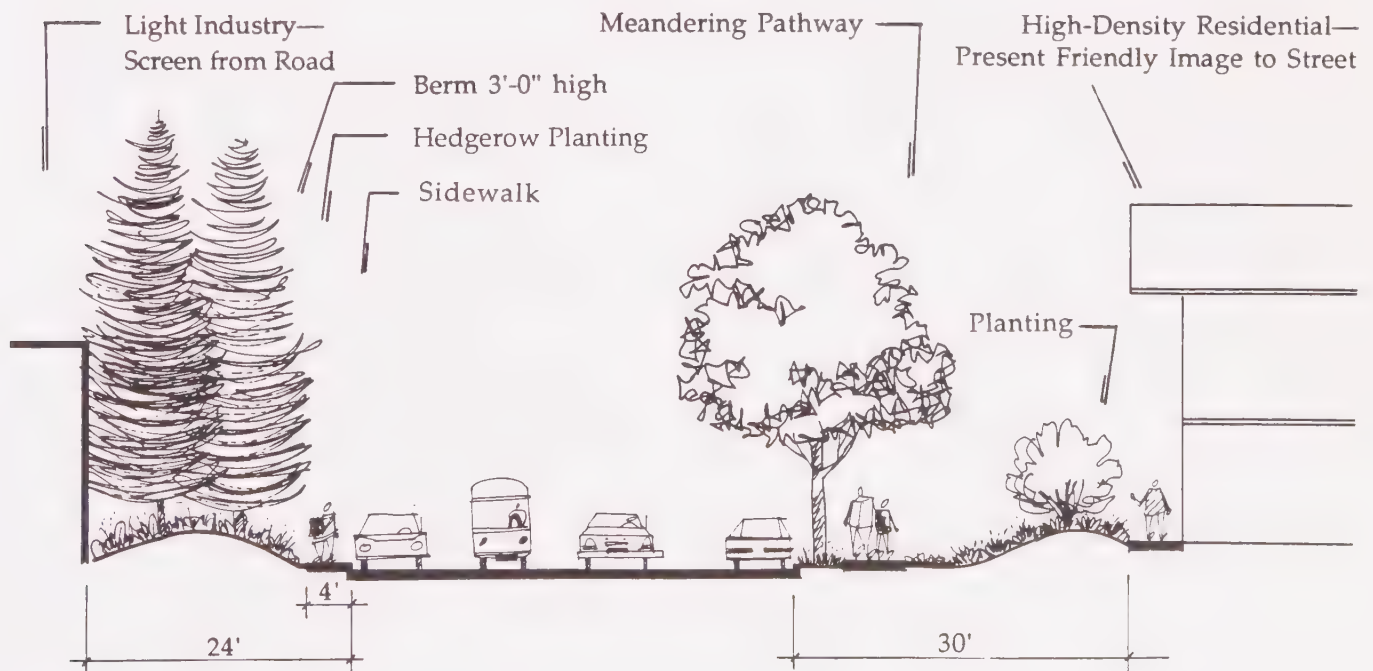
Typical Cross Section at Bell Road looking Northwest (B' - B)
